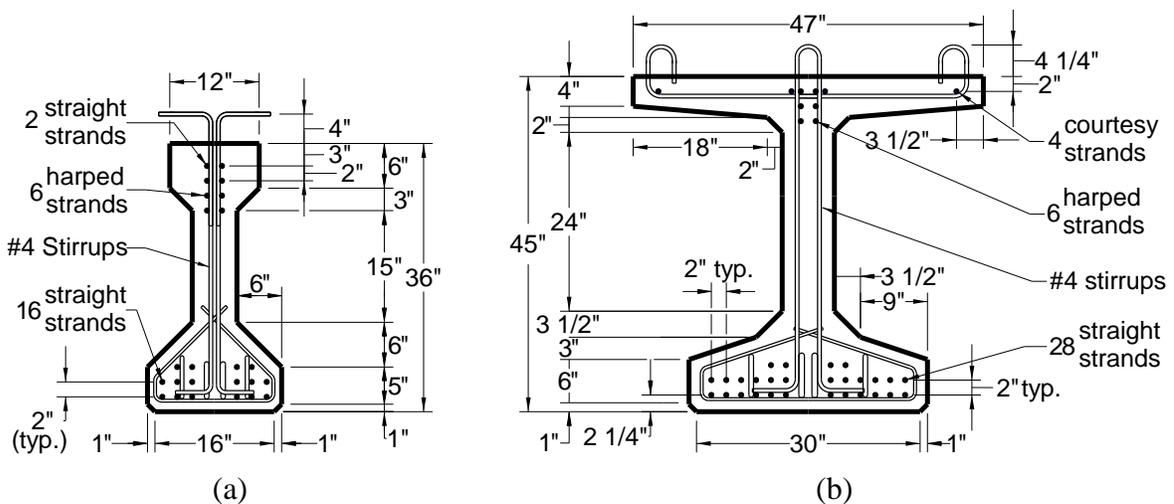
Cross-sectional geometry and reinforcement details for (a) AASHTO Type II girder and (b) PCBT-45 girder.
